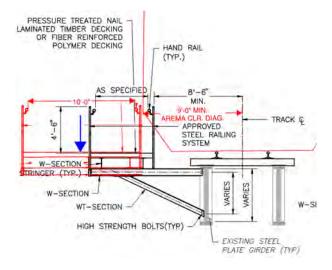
Marked-up Sketch of Cantilevered Trail Structure
